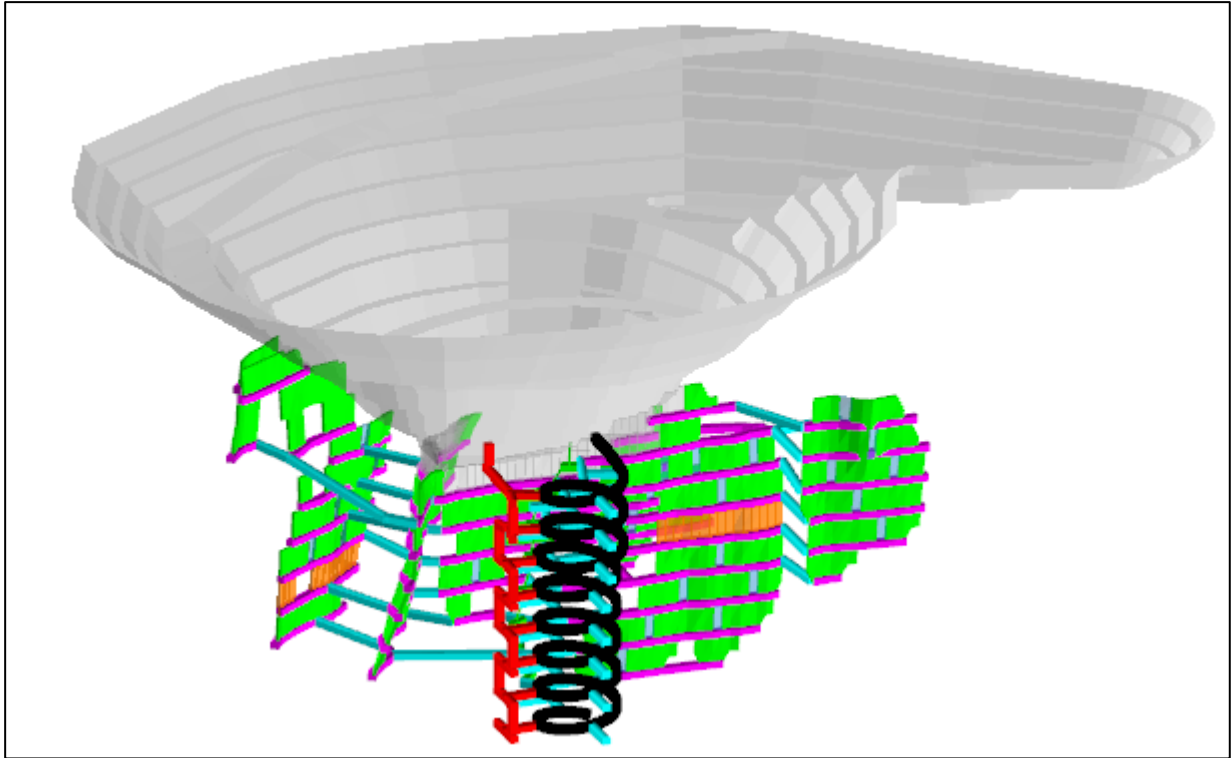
Break of Day Underground design below currently planned Break of Day pit
